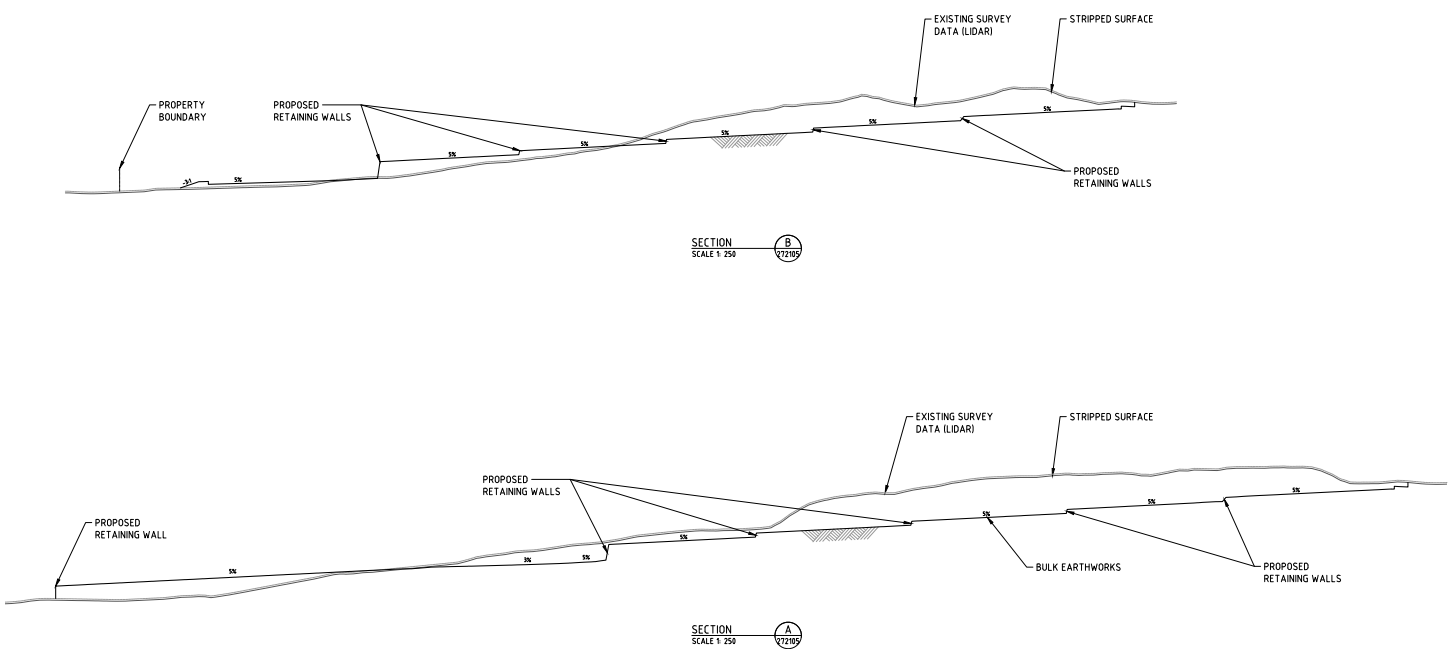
Existing & Proposed Sections (subject to detailed design).
